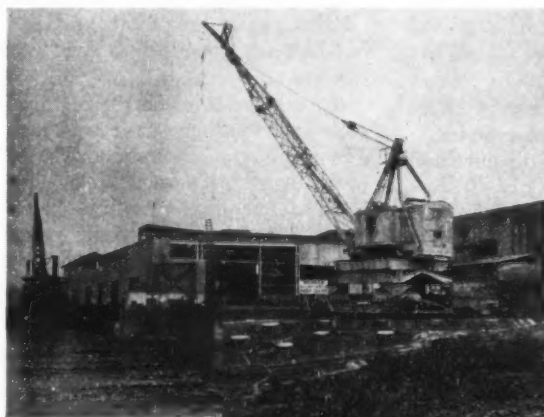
This dock, when remodeled, will have overhead bridge connection to a warehouse, permitting loading from a platform on the water side.
